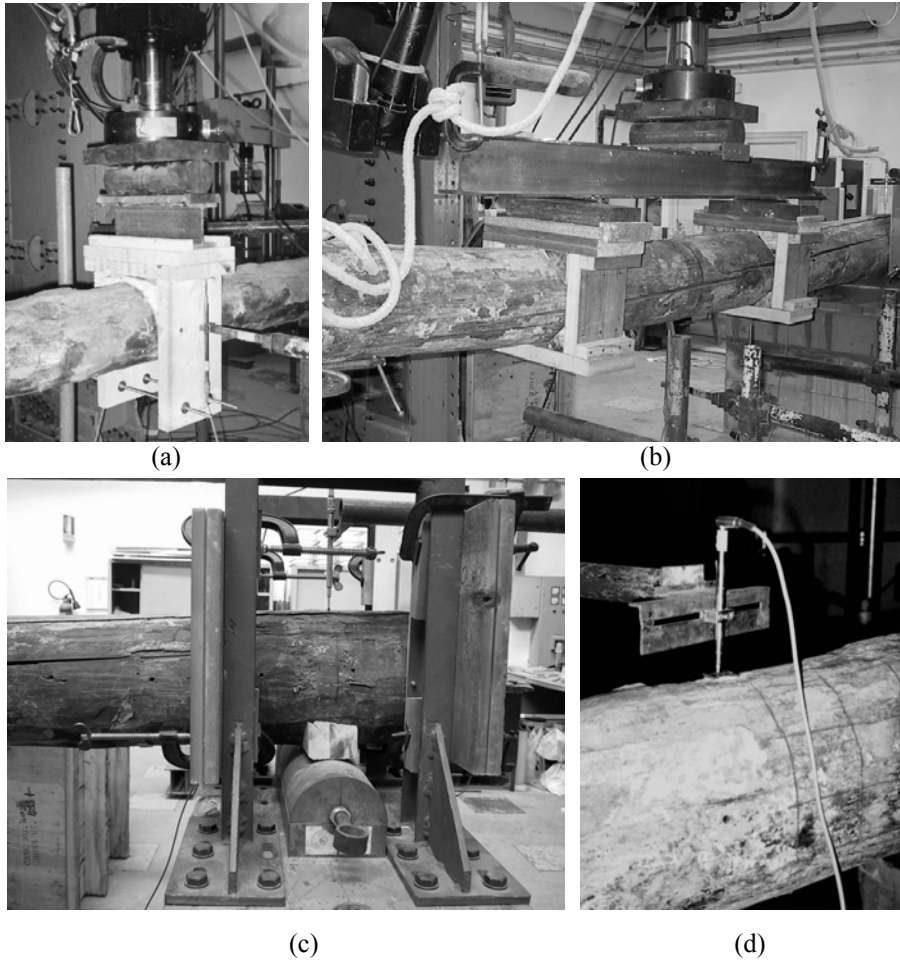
Testing equipment used for bending tests: load device used for scheme A (a); mid-span load for scheme B (b); one of the external hinged support (c); a LVDT transducer placed on the beam (d).
